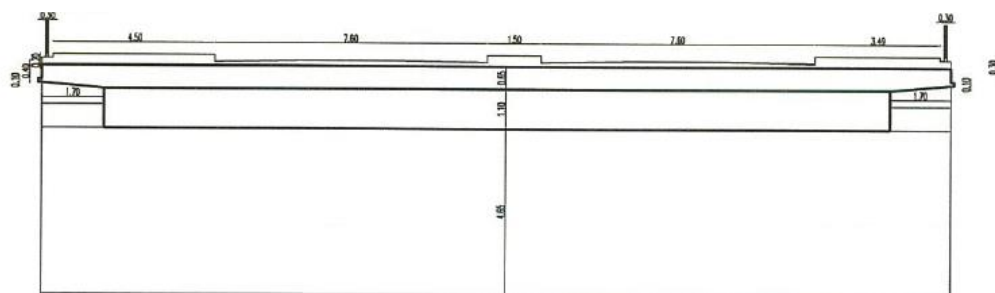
Cross-section (3-3) through tunnel ceiling
